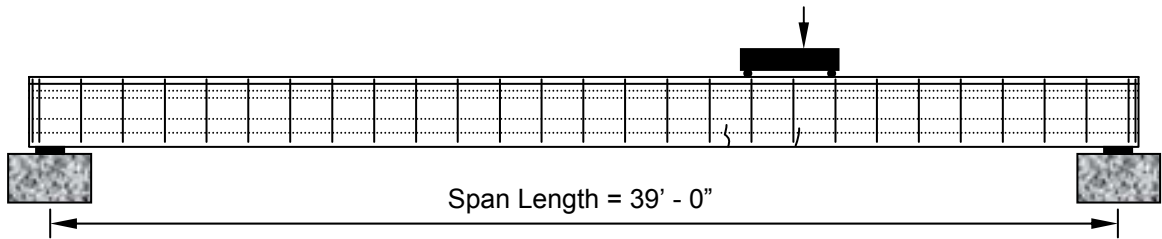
Crack Pattern at Cracking Load for STD-M-1W
